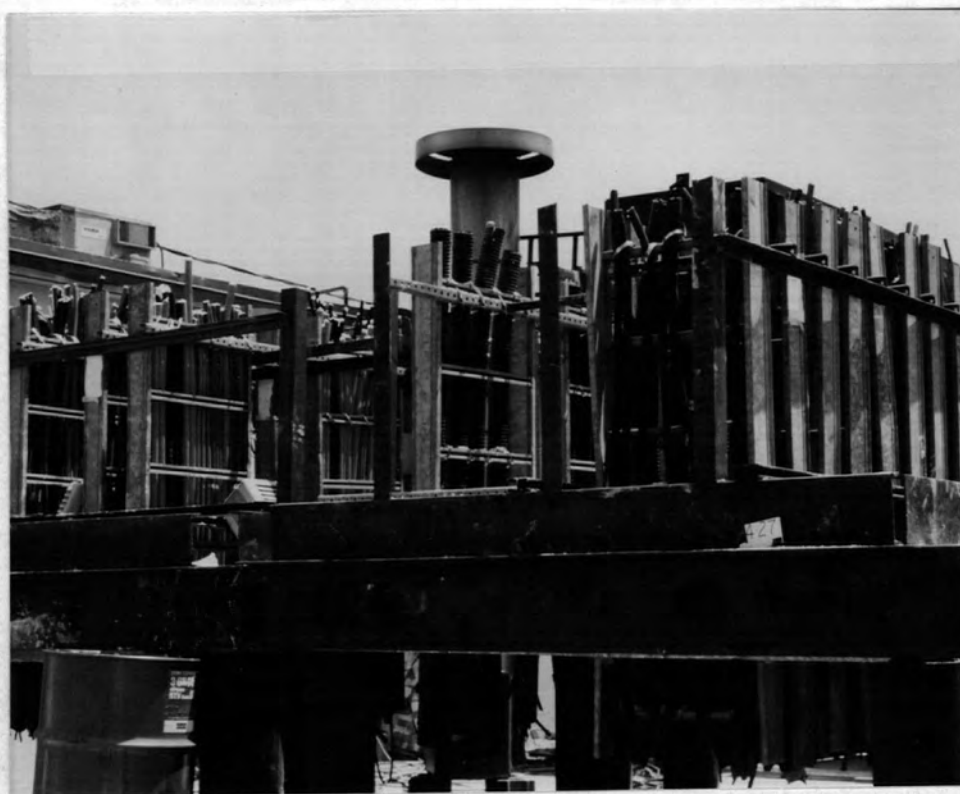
OVERALL VIEW OF SLAB AFTER ASSEMBLY
